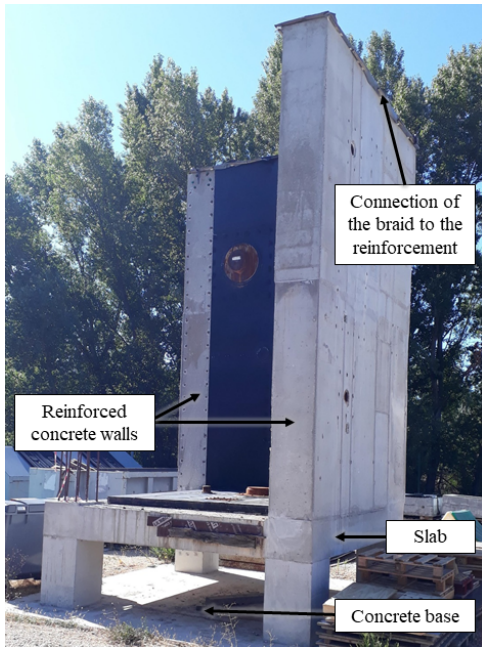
Scaled model of the reinforced concrete structure at the testing facility of EDF TEGG.
